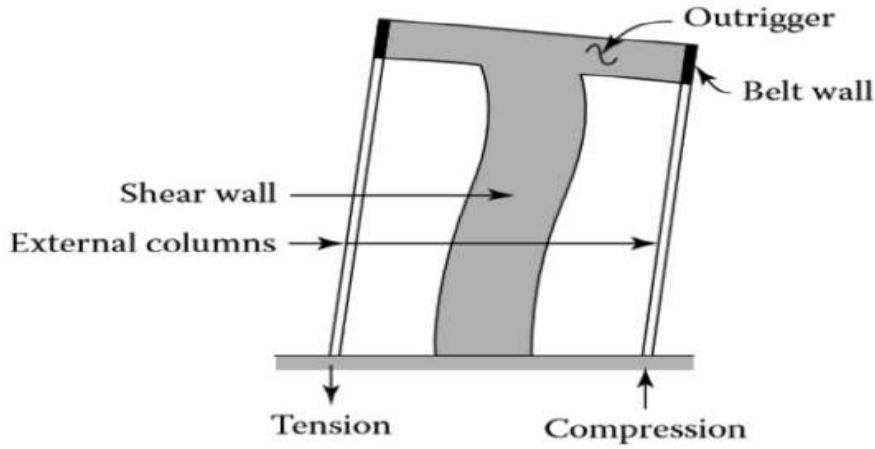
Lateral force transfer in Outrigger and Belt Truss system[51]
